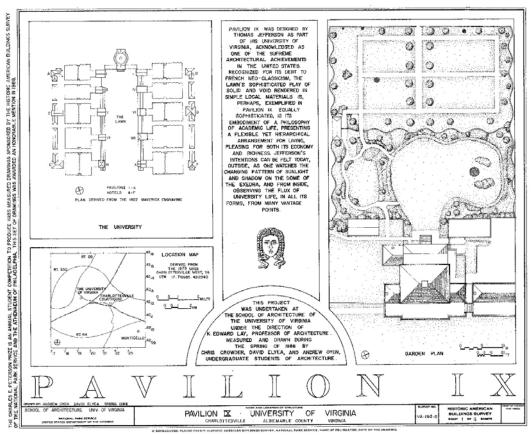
This HABS drawing set cover sheet for Pavilion IX, West Gardens, includes a Garden Plan on the right. (R-JAV-FMRC-FF-1988-65978_1-M-4-HABSPavIX.JPG)
